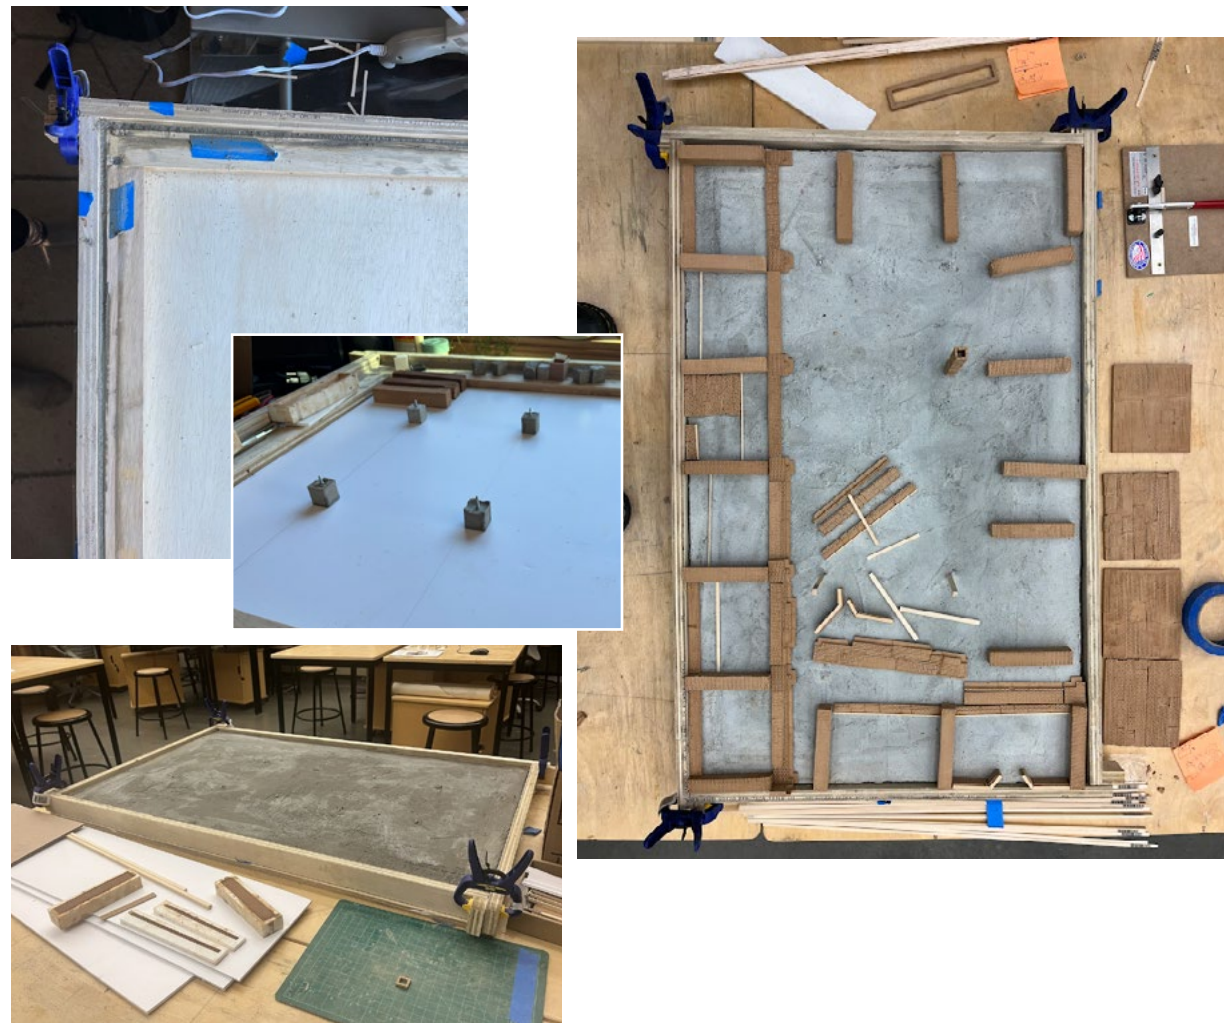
Modeling process: concrete foundation elements, facade construction
